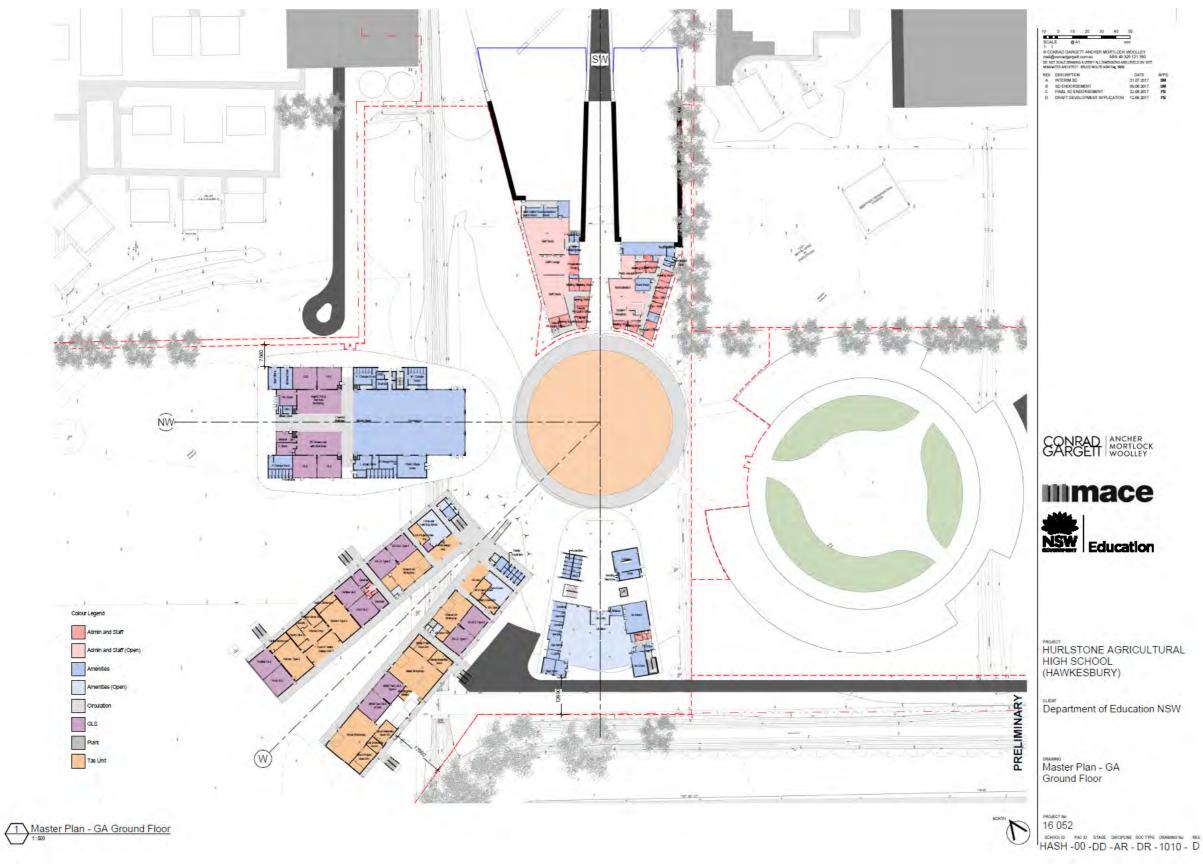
Proposed Master Plan – GA, Ground Floor Conrad Gargett Ancher Mortlock Woolley (2017) HASH-00-DD-AR-DR-1010-C
